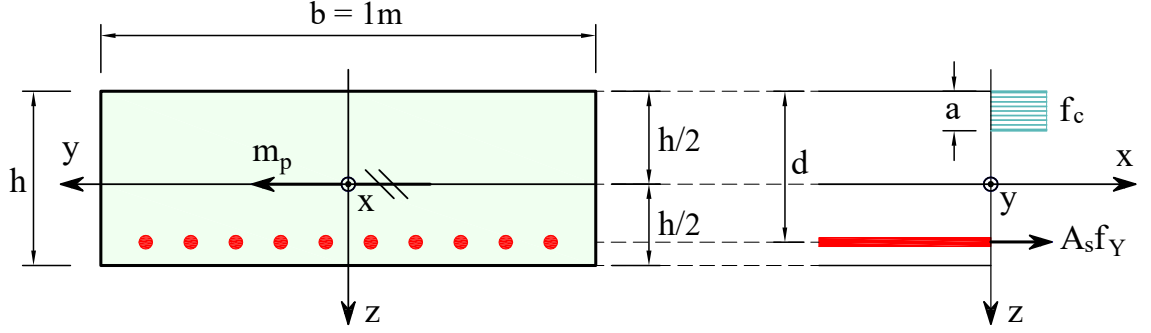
Slab element subjected to pure bending in the reinforcement direction
